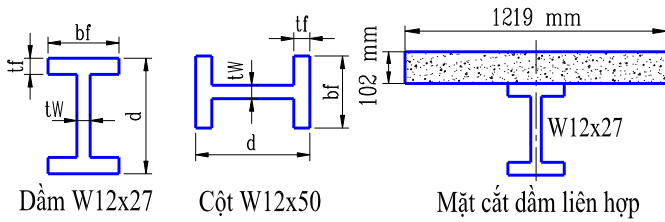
Section of beams, steel columns, composite beams in plane frames
